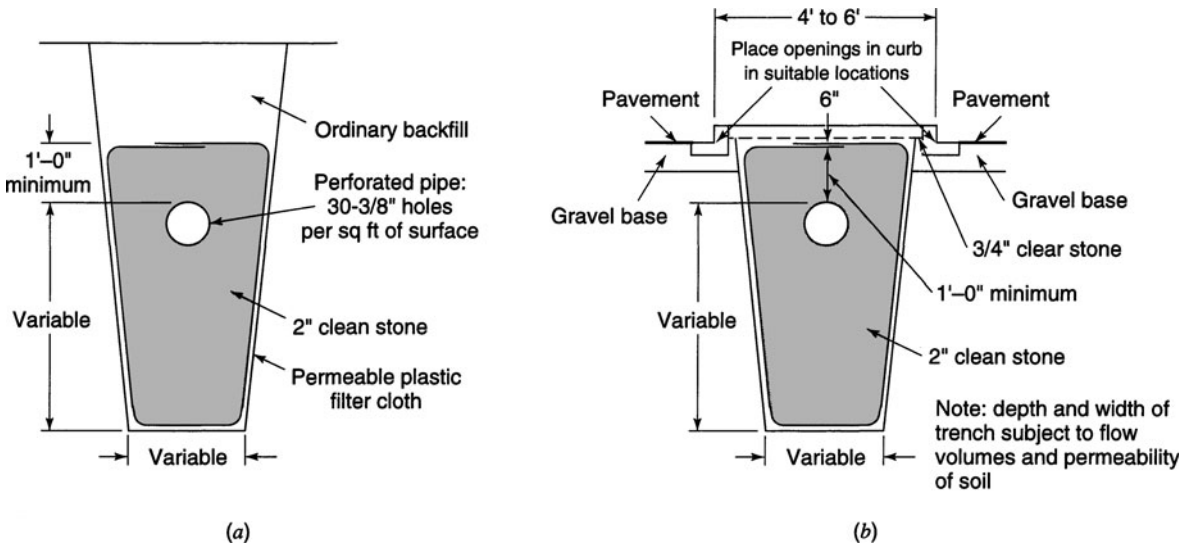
(a) Typical trench for perforated storm sewer; (b) Typical trench for parking lot drainage (from American Iron and Steel Institute (1995)).
